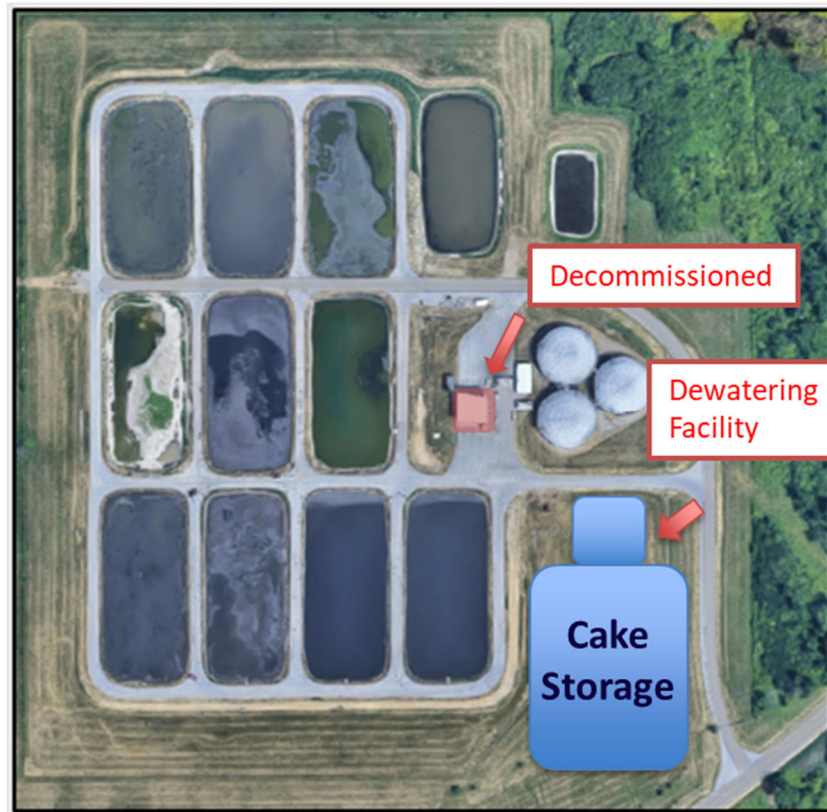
Strategy 4 – Garner Road Facility – Conceptual Site Plan
